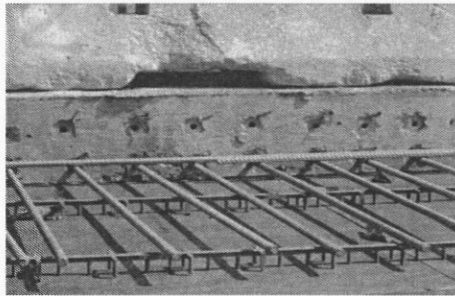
Plastic rebar supports and threaded rebar connectors
